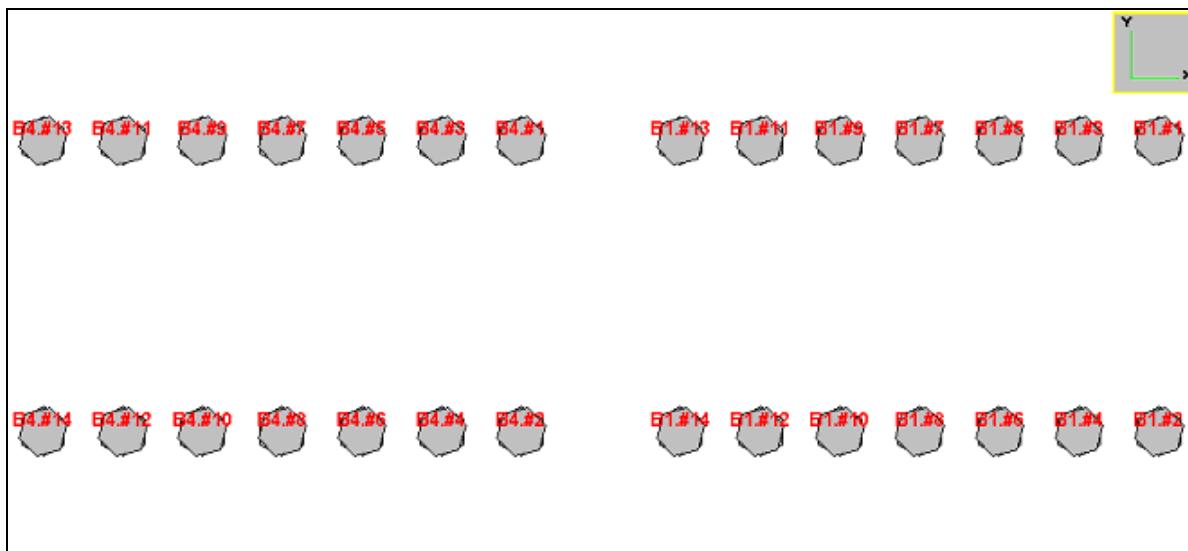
Lower flange bolts numbering (distances: 183mm, 50mm)
